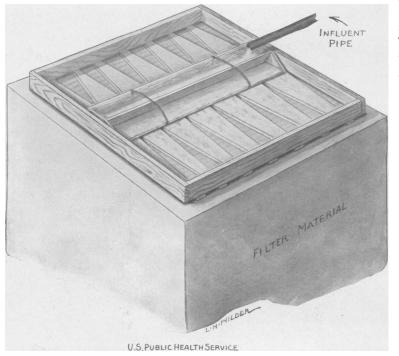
Sewage distributor; tipper and tray board, converging boards.
